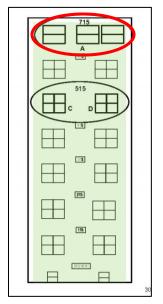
The windows circled in red are proposed to be replaced with three one-over-one sash windows. Staff finds that paired sash windows in each opening to correspond with the floors below would be more appropriate.
